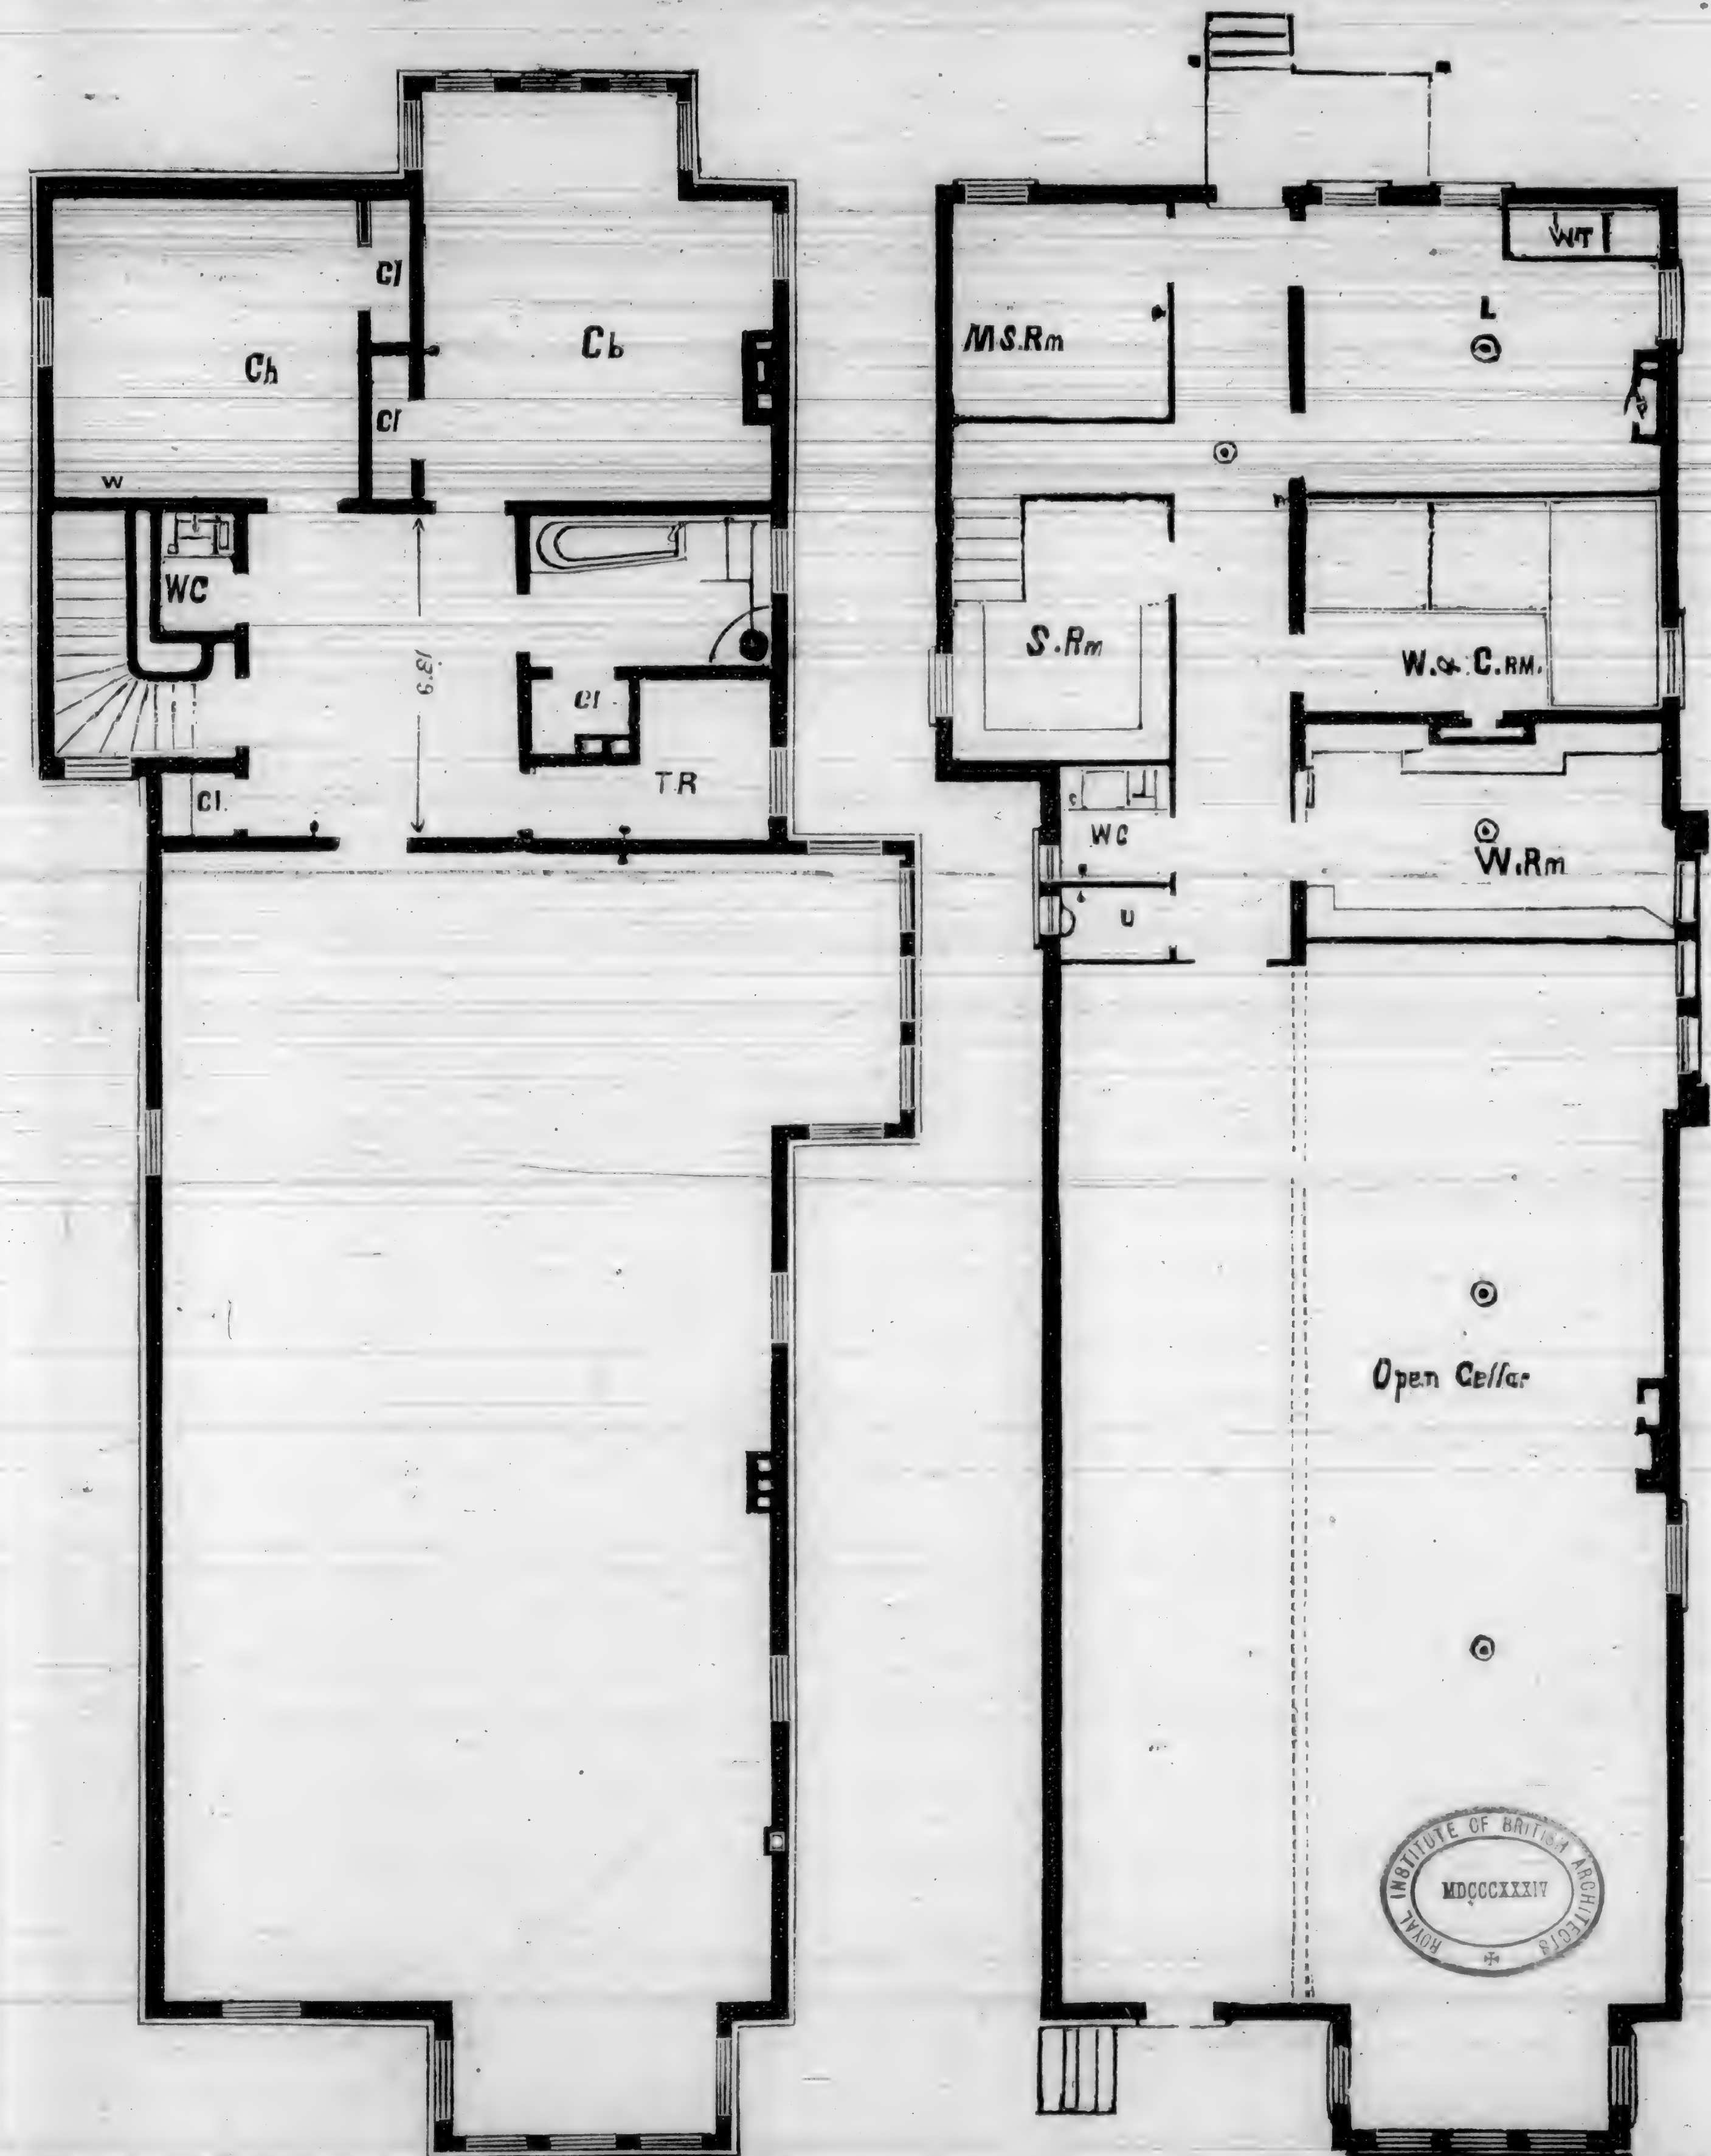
GROUND PLAN FOR PLATES 1 AND 2.
